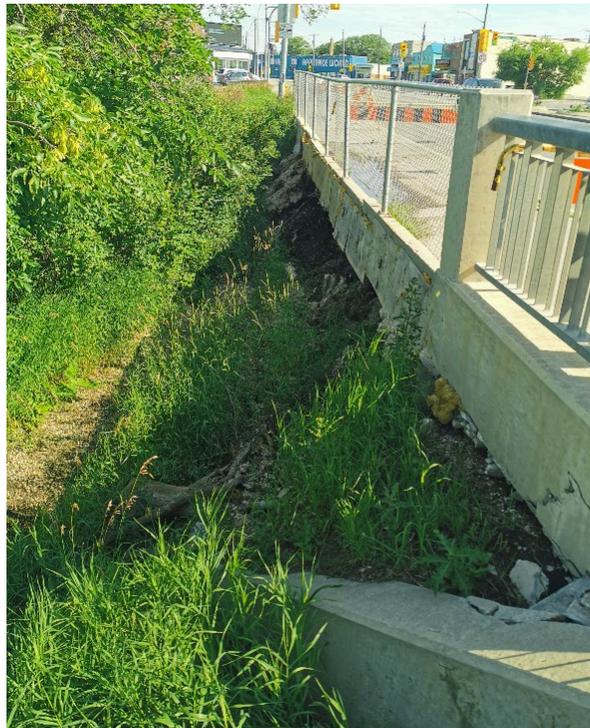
Undermined section of sidewalk foundation (looking north from north limit of the Old St. Vital Riverwalk)
